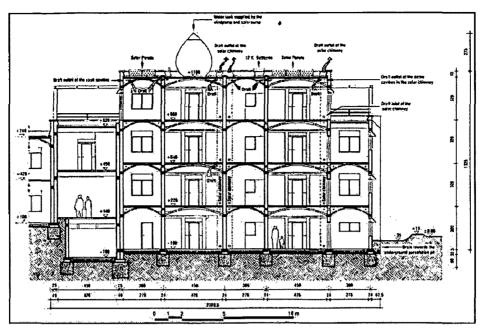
Section of the third building Source: http://www.earth-auroville.com/photos/14-3rd-building-section.jpg
